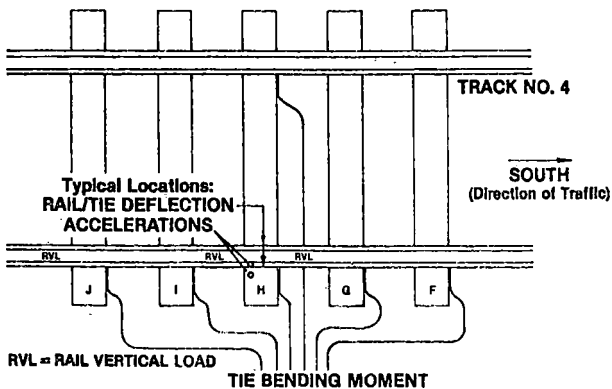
LAYOUT OF INSTRUMENTED TEST ZONE
